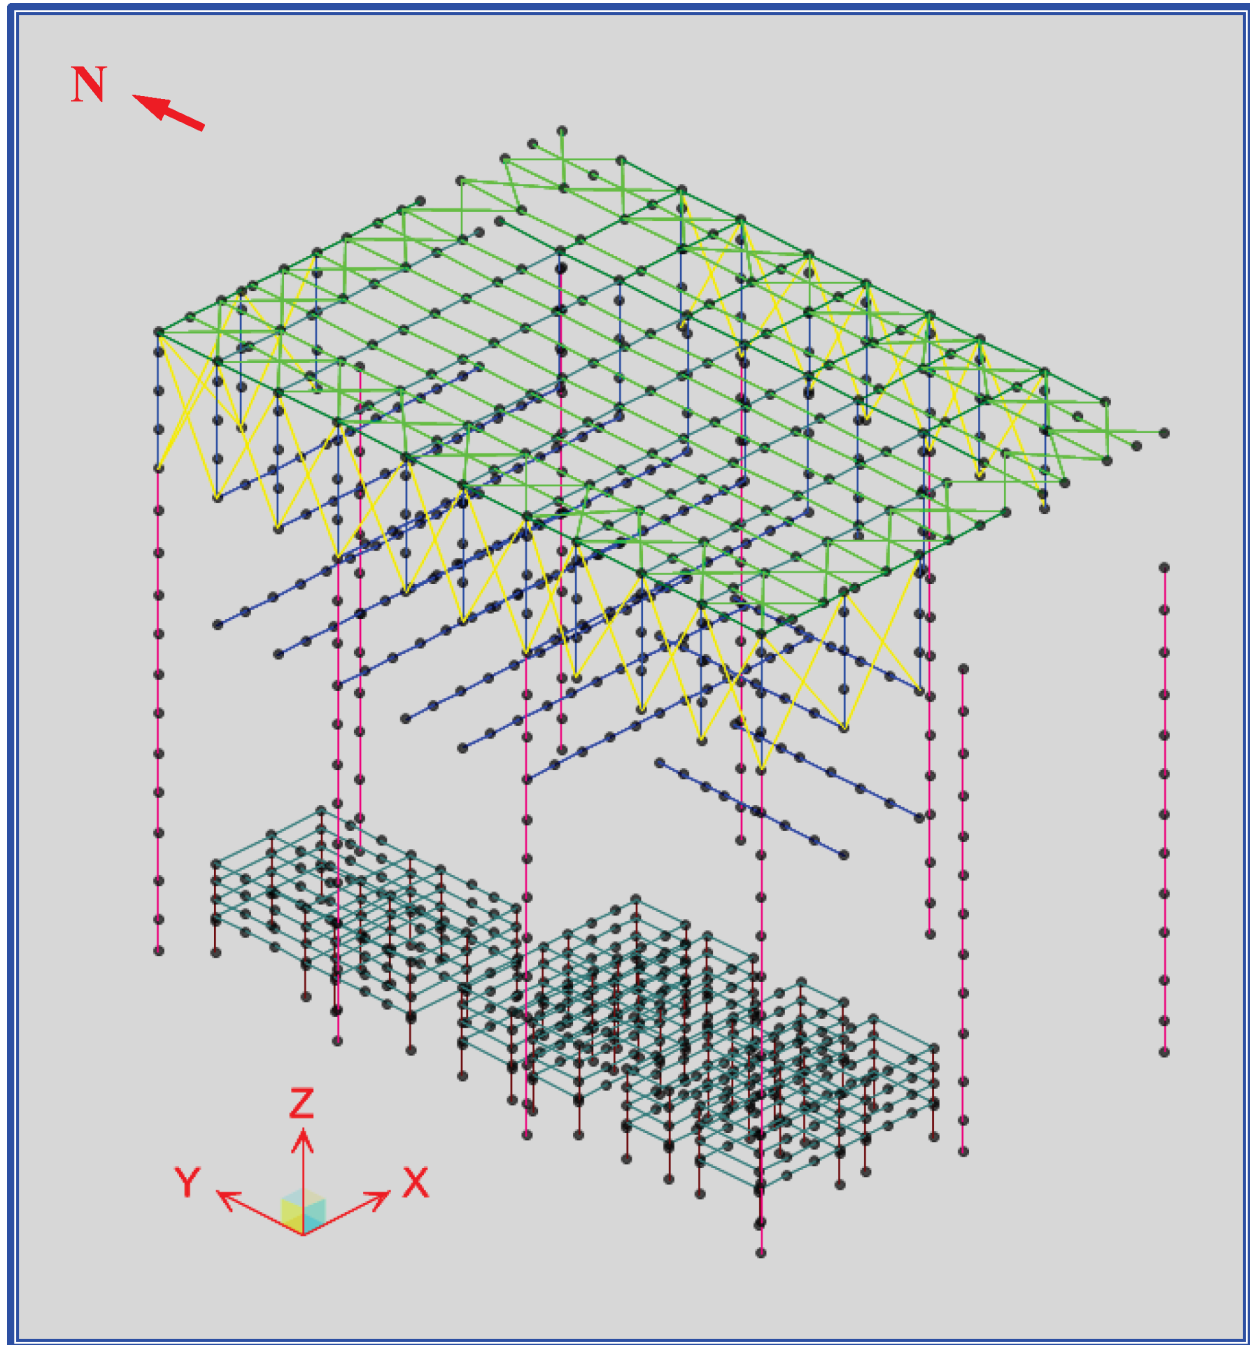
SAP2000 Control Building Model with Backfill Soil
